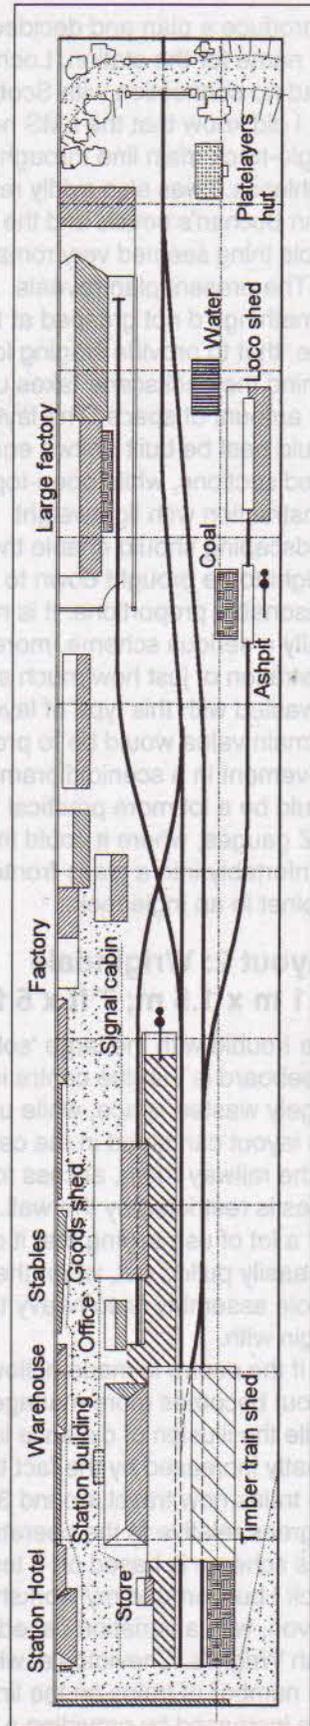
/1 Track plan of Ashburton station, GWR (not to scale).
